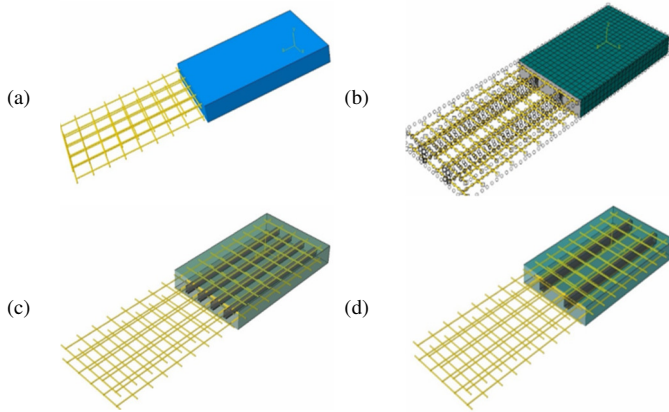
Simulation of the specimens using the Abaqus program: (a) reinforcement concrete, (b) discretized slab elements for concrete and GFRP bars, (c) reinforcement concrete of four steel boxes, and (d) reinforcement concrete of two steel boxes.
